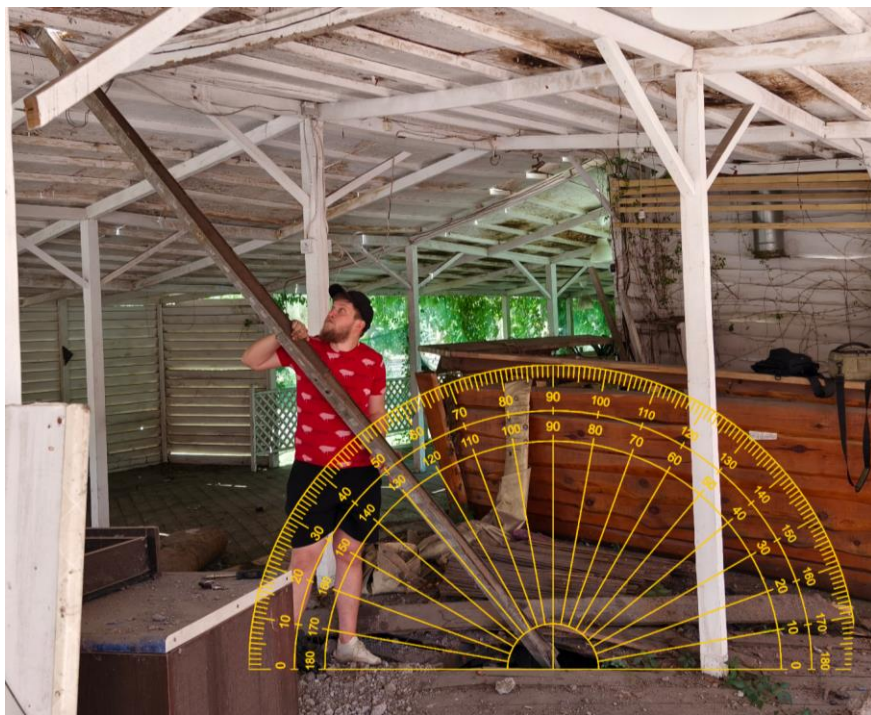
Determining the angle of impact with a horizontal surface at the site of shell hit 11.
